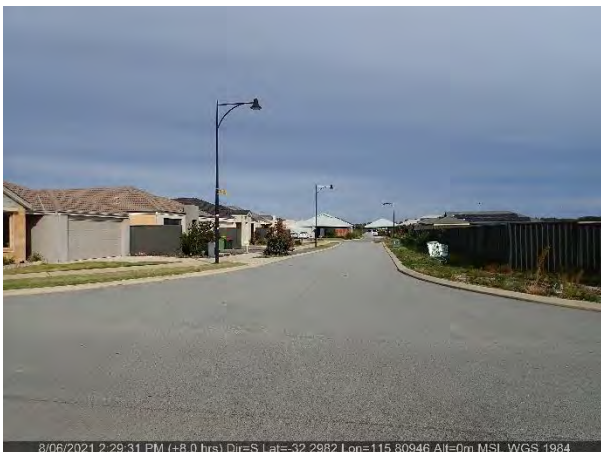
Looking at the road, infrastructure and dwellings adjacent to the development site.
